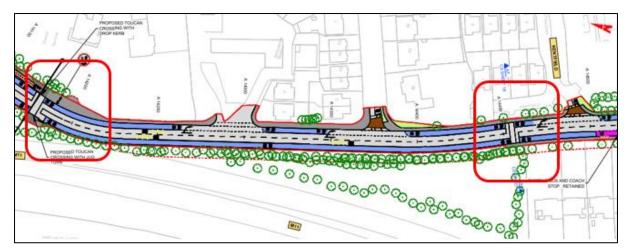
Extract from General Arrangement Drawings at Seaview Park (Sheet 41)
